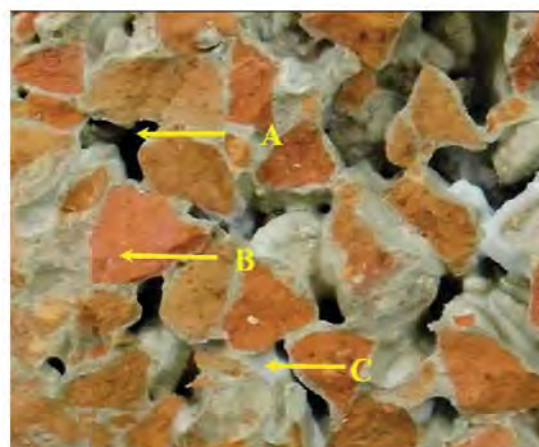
Fracture surface of PGC containing RB; (A) void; (B) fractured RB; and (C) geopolymer paste.
